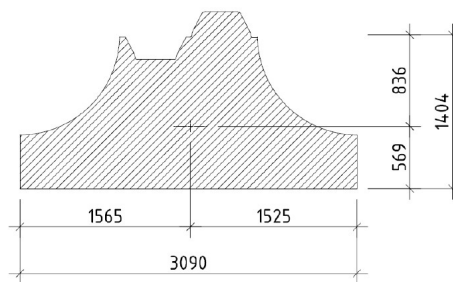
Eccentricity of concrete fill (De Klerk B.V., 2014)
